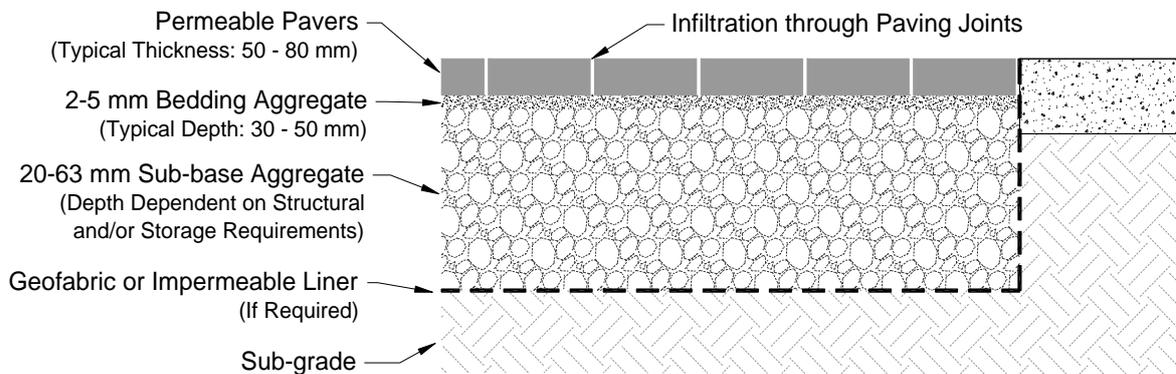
The four layers of a permeable pavement system (adapted from Lucke and Beecham, 2019)
